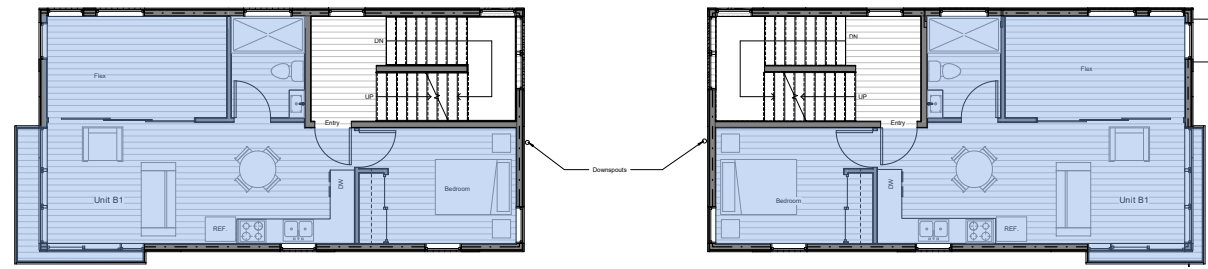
Typical upper level floor plan (Fremont Urban Apartments, Design Recommendation 2017).
